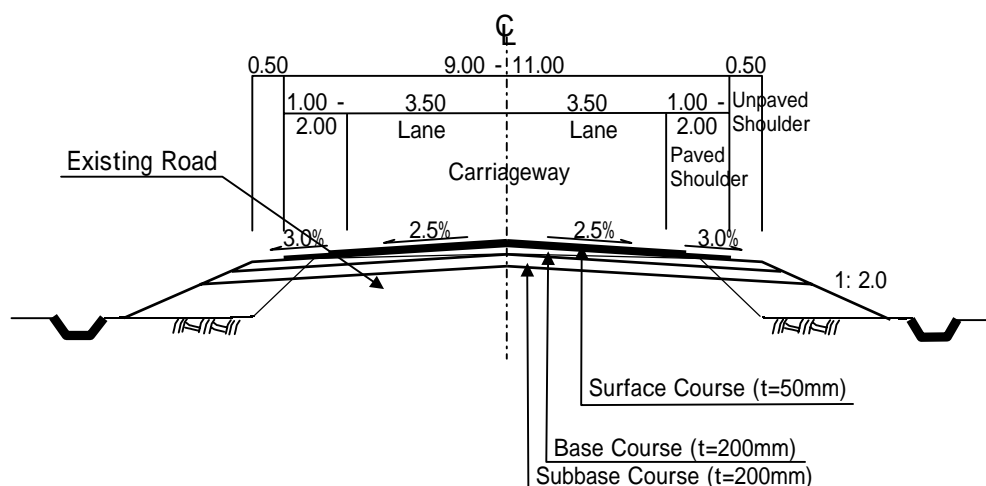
Typical Cross Section for Proposed Route (L = 33.80km)
